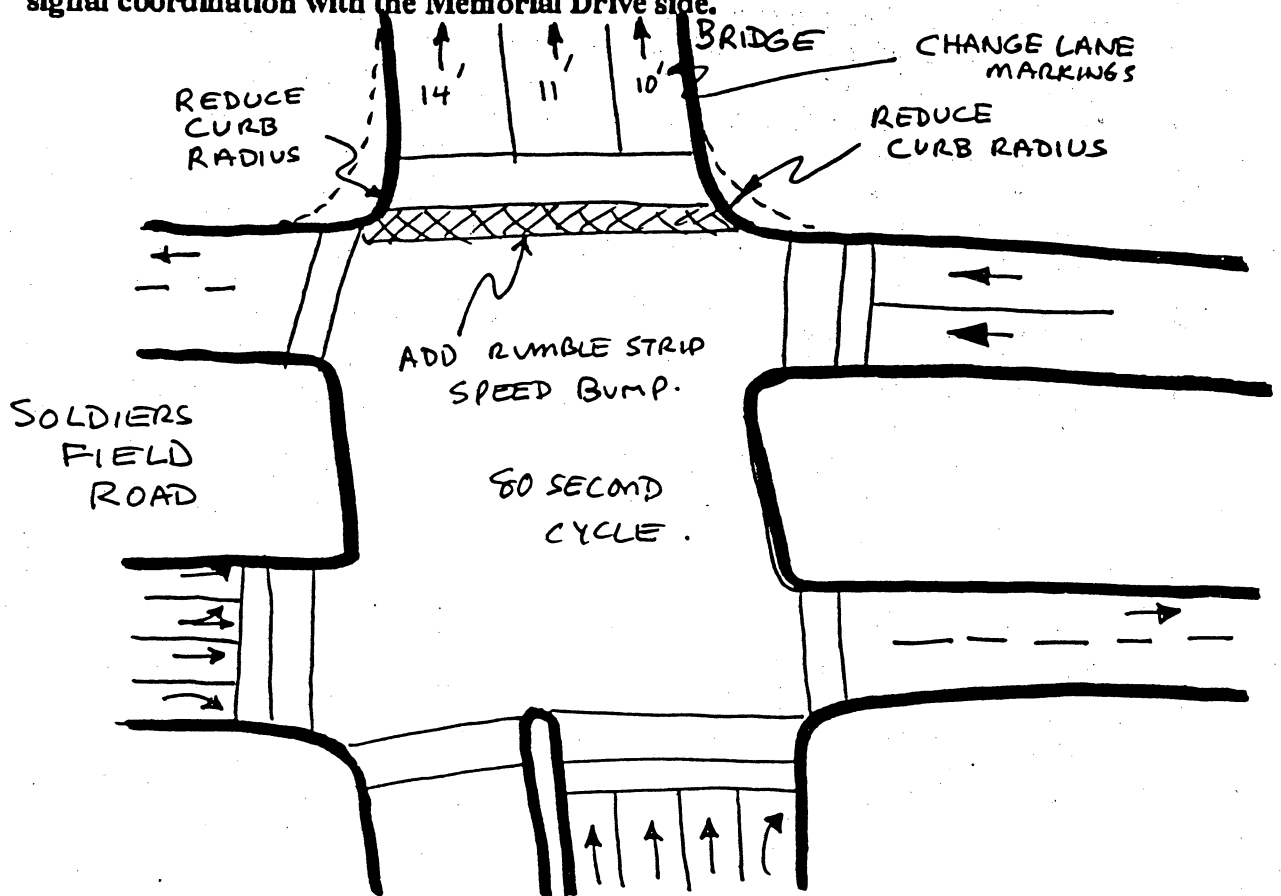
SOLDIERS FIELD ROAD AND RIVER STREET BRIDGE
